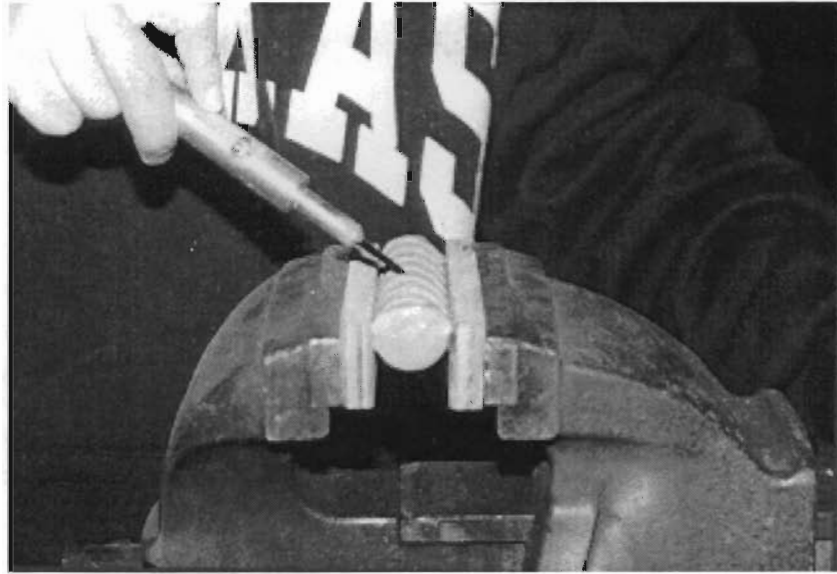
Adhesion testing of epoxy-coated bar specimen.
